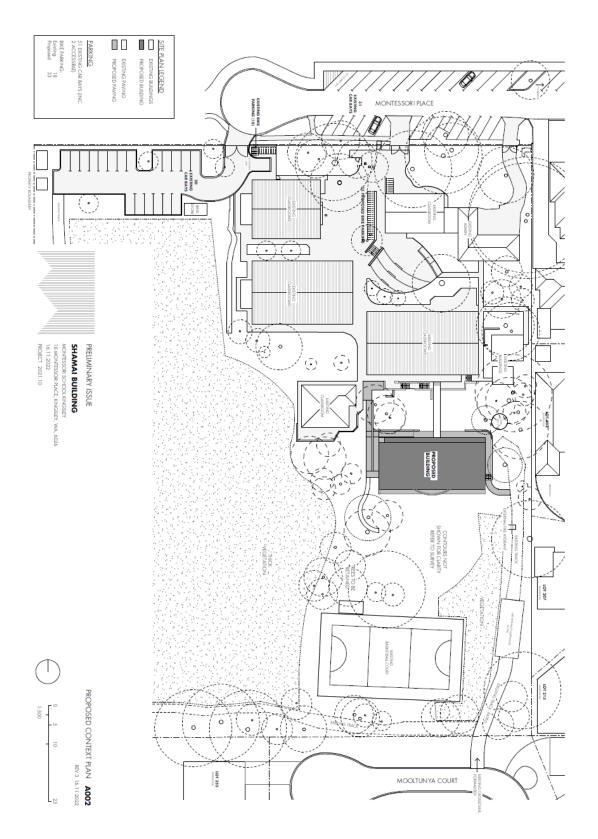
Site Plan Proposed Building and emergency access to Mooltunya court
